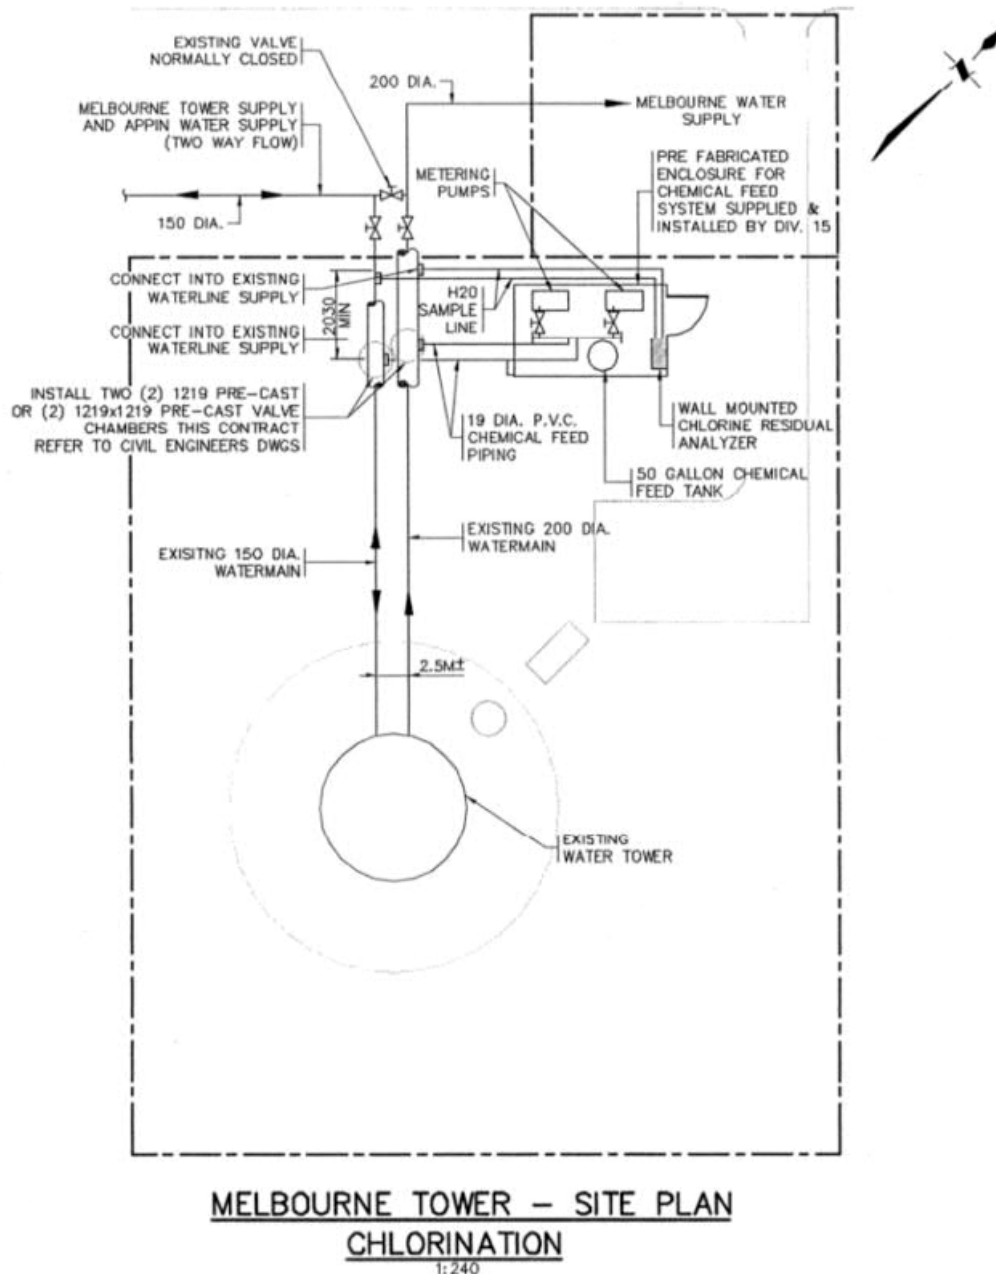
Melbourne Standpipe and Re-Chlorination Systems Site Plan Drawing
